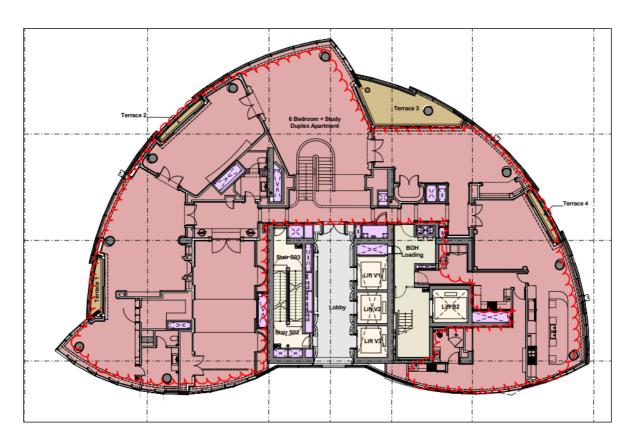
| Proposed 6 bedroom + study duplex apartment layout on Level 48 (Source: MOD 3)
